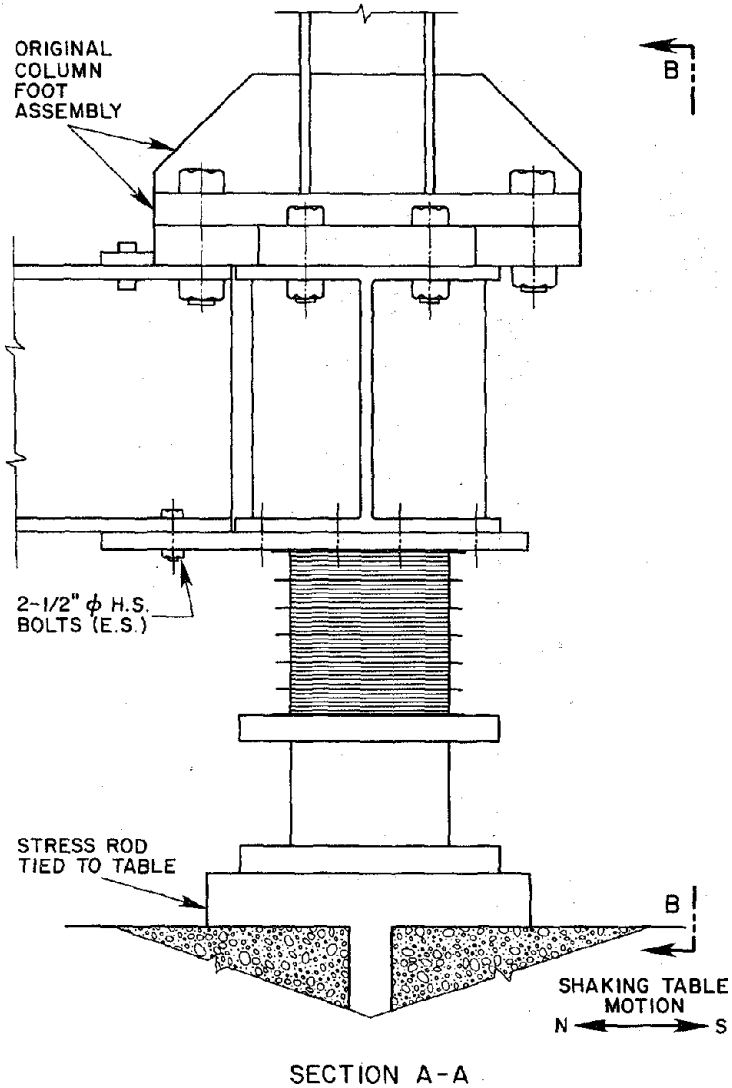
RUBBER BEARING CONNECTION - DETAIL
